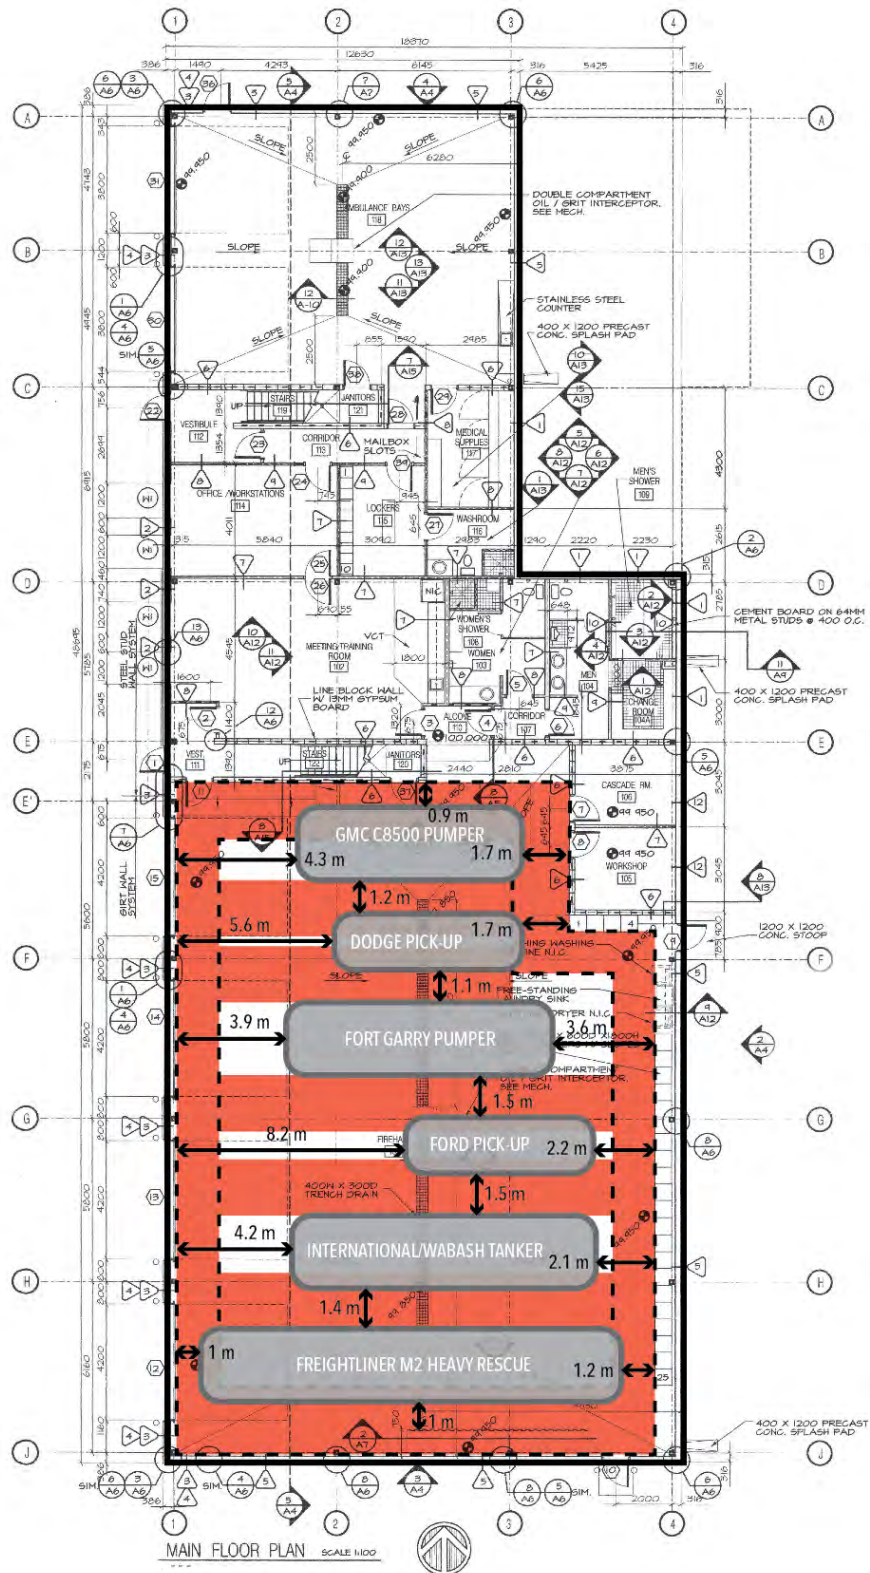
Existing floor plan showing configuration and clearance issues in Apparatus Bay
